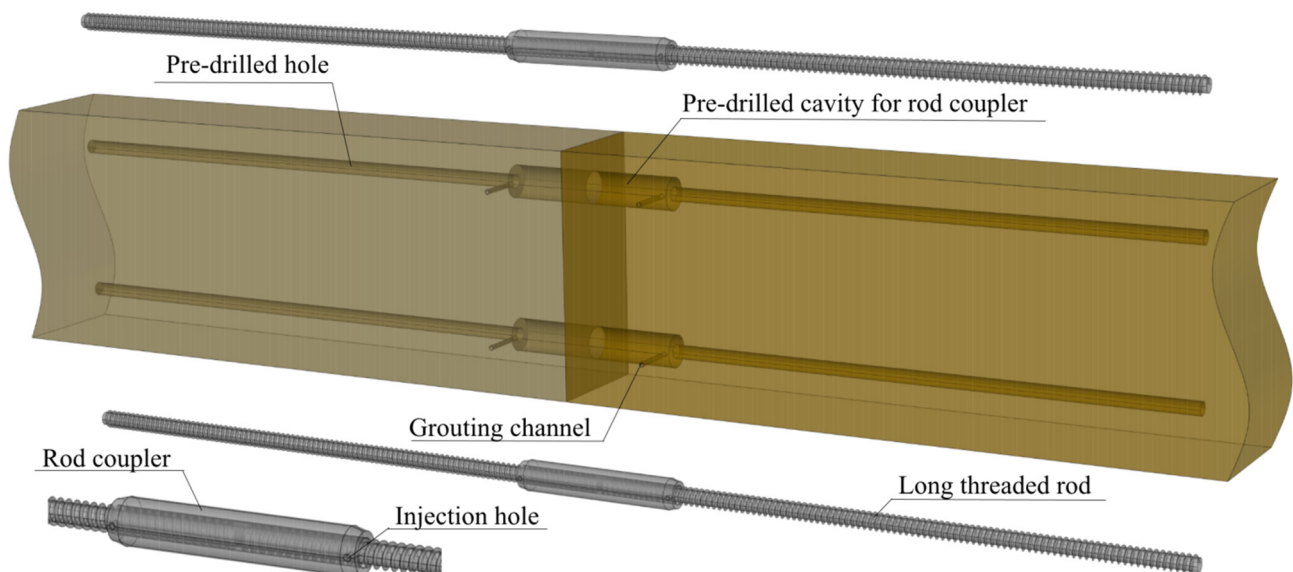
Principal layout of splice connection with long threaded rods and grout-filled couplers.
